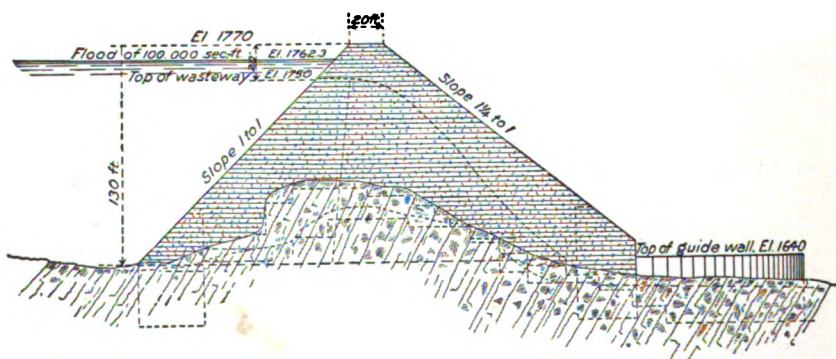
SECTION OF PROPOSED BUTTES-DAM THROUGH SPILLWAY, SHOWING END WALL OF ROCK-FILL, GILA RIVER, ARIZONA.
